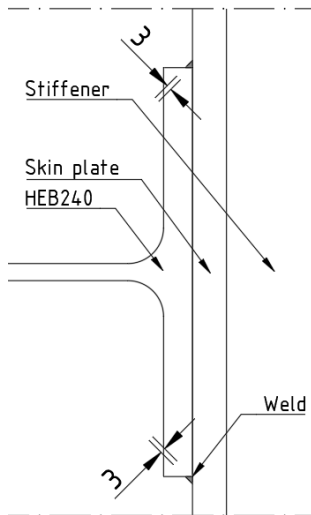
Welded connection HEB240 - skin plate
